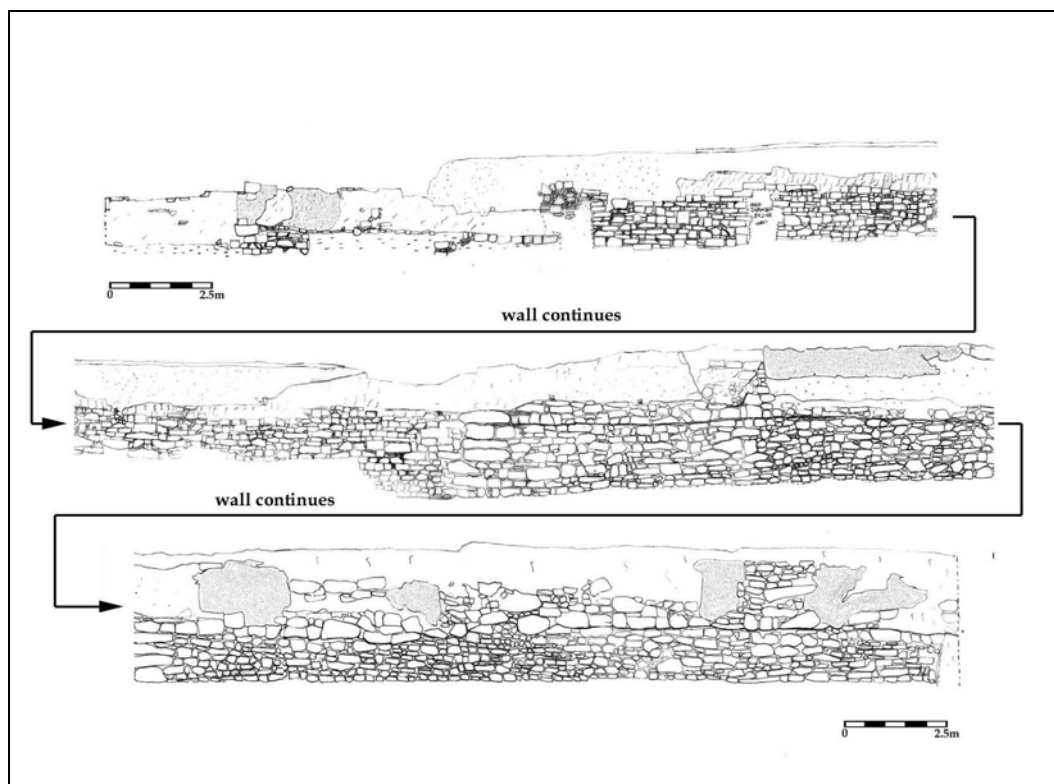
Measured drawing of Sheep St stretch, post-excavation (outer face)
